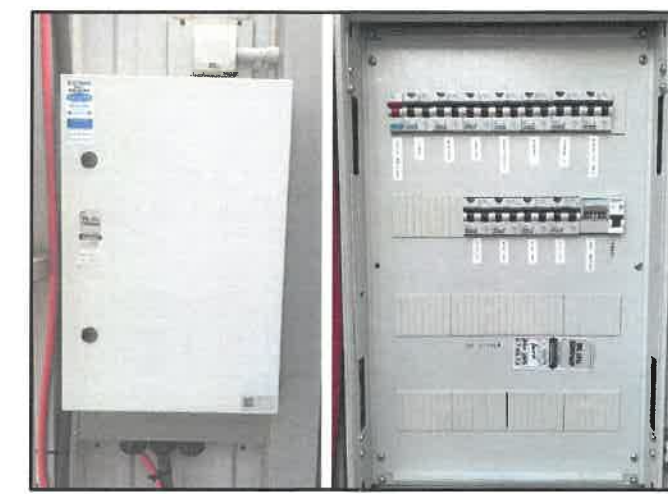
(PROPOSED POWER BOARD FROM SITE PROVIDER)
